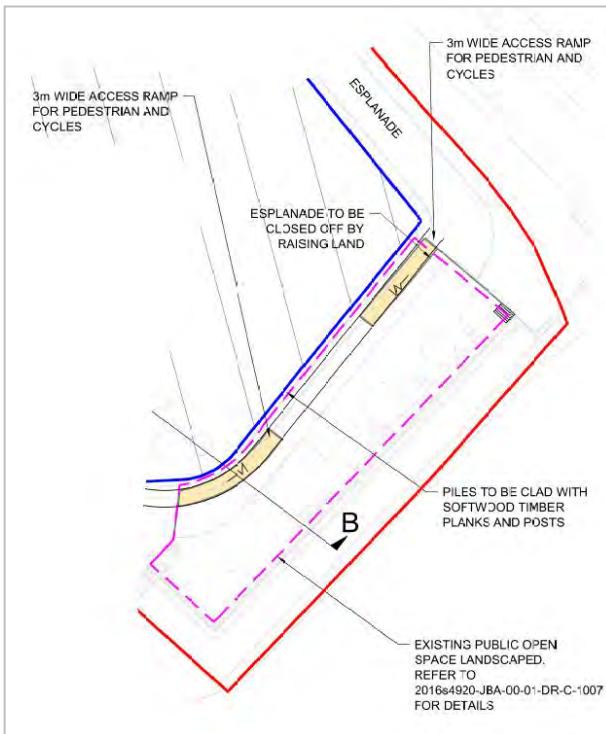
Clip of general arrangement between Pump House and Rochester Bridge on the Phase 1 site
